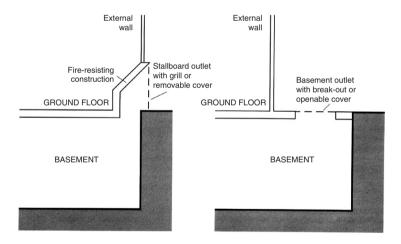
Fire-resisting construction for smoke outlet shafts
